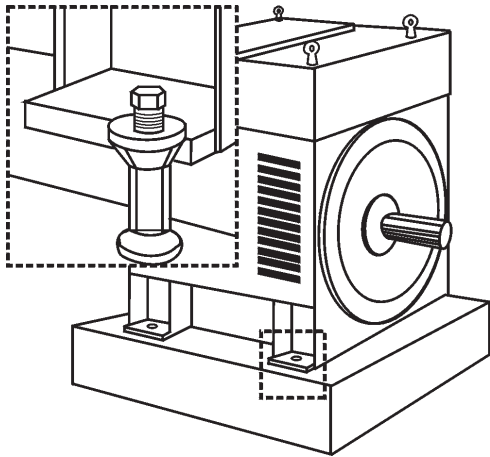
Motor mounted on a concrete base with foundation studs
